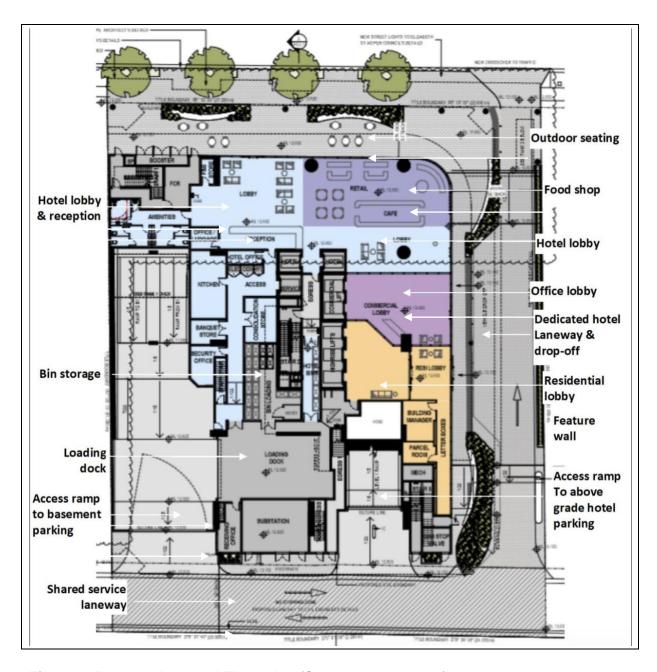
Proposed Ground Floor plan (Source: rothelowman)
